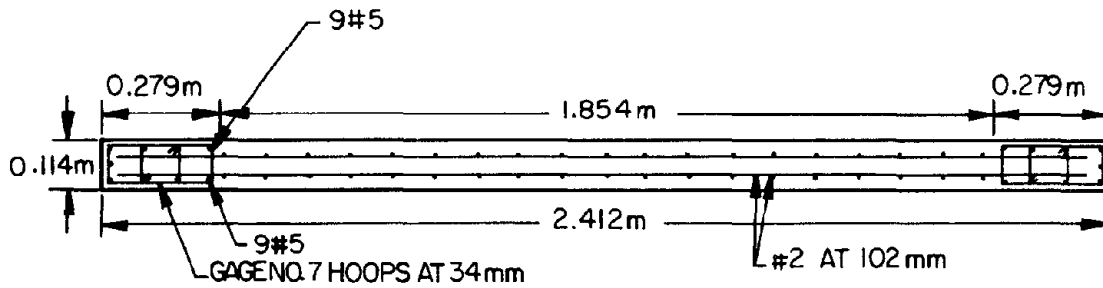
Detailed Cross-Section of Rectangular Wall
